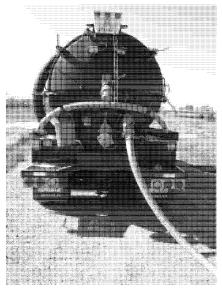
Woodbury Site - Haul Truck Liner Installation Activities (10/13/2009 Photo by William Westley Approved by Katie Winogrodzki).
